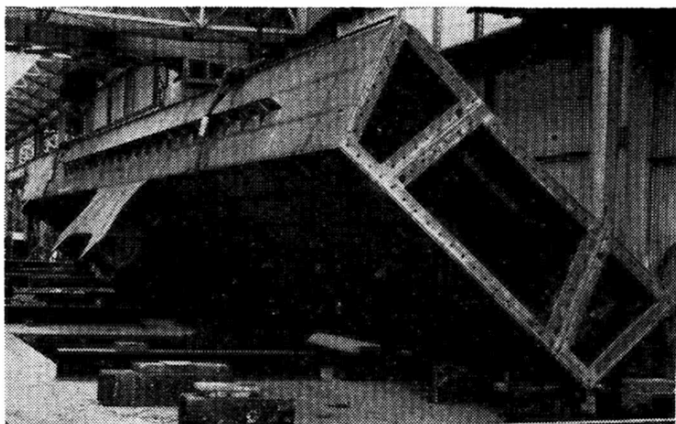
SLINGING A TOP CHORD UNIT FOR THE CHEPSTOW BRIDGE. THE INTERNAL FLANGES AND THE UNDERSIDE OF THE ORTHOTROPIC PLATE DECK ARE SHOWN
